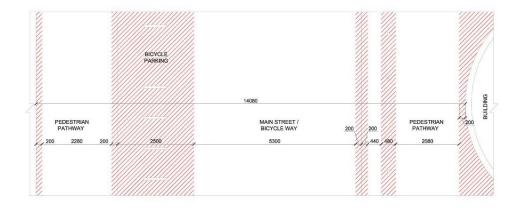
Street width and buffer spaces (in mm) for Gateway 4 in the area surrounding Hauptwache in Frankfurt am Main
